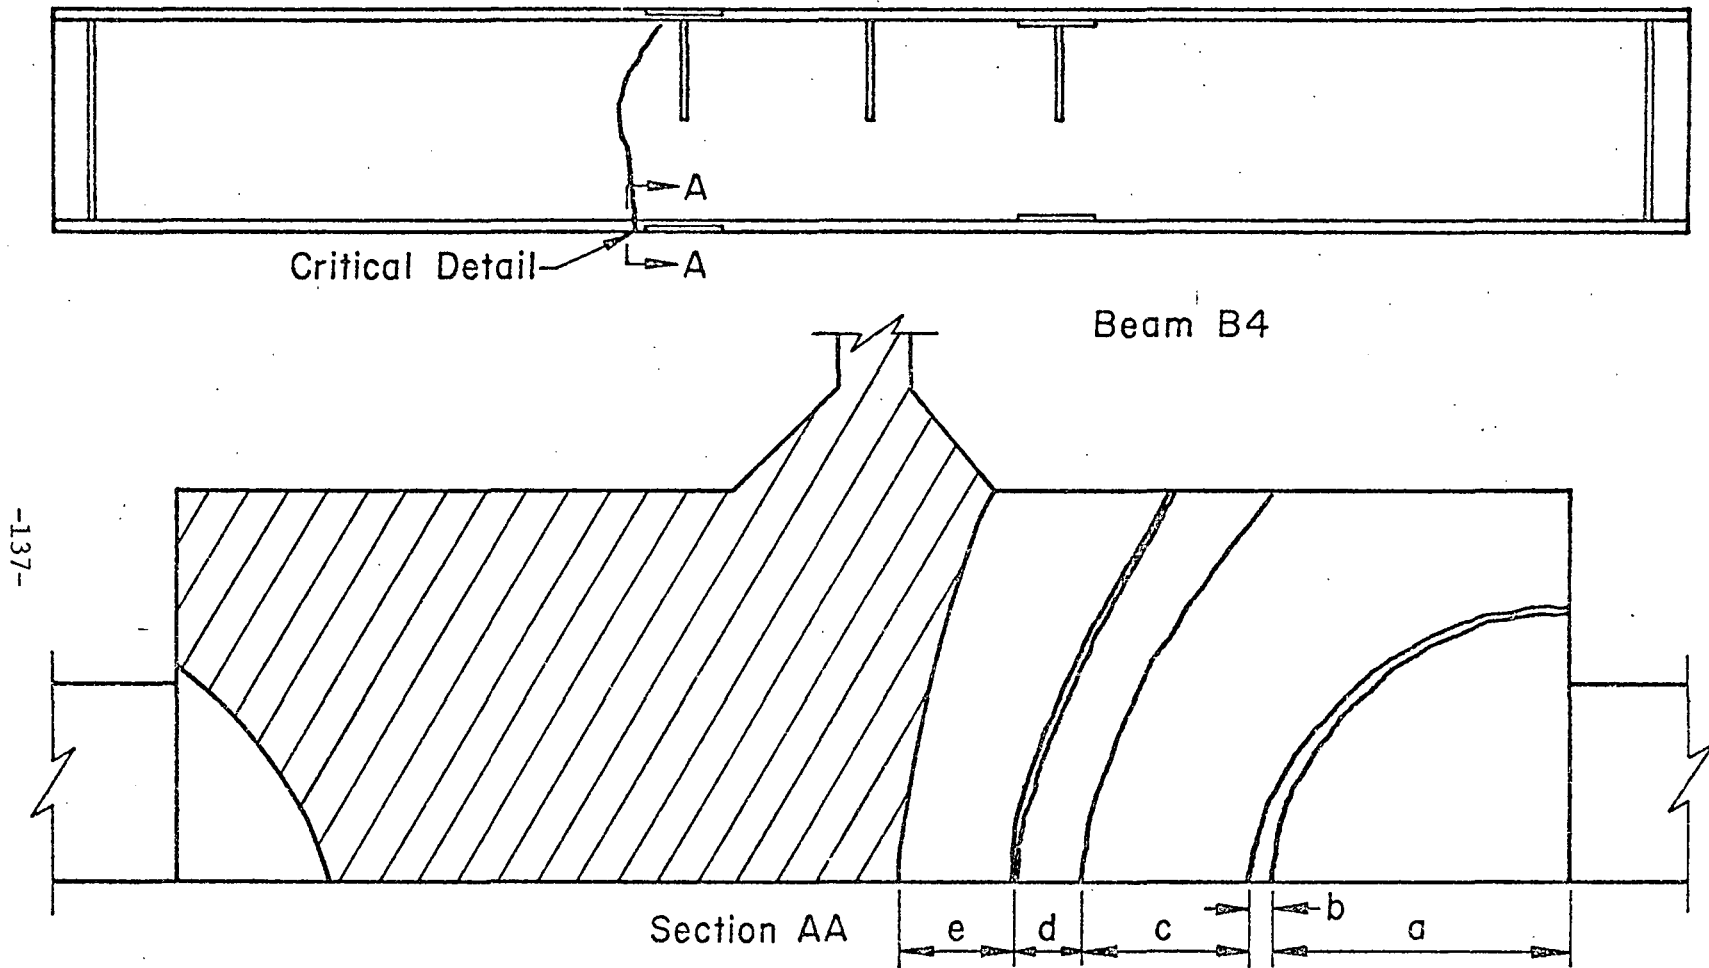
Fatigue and Fracture Surface, B4 (A36)
